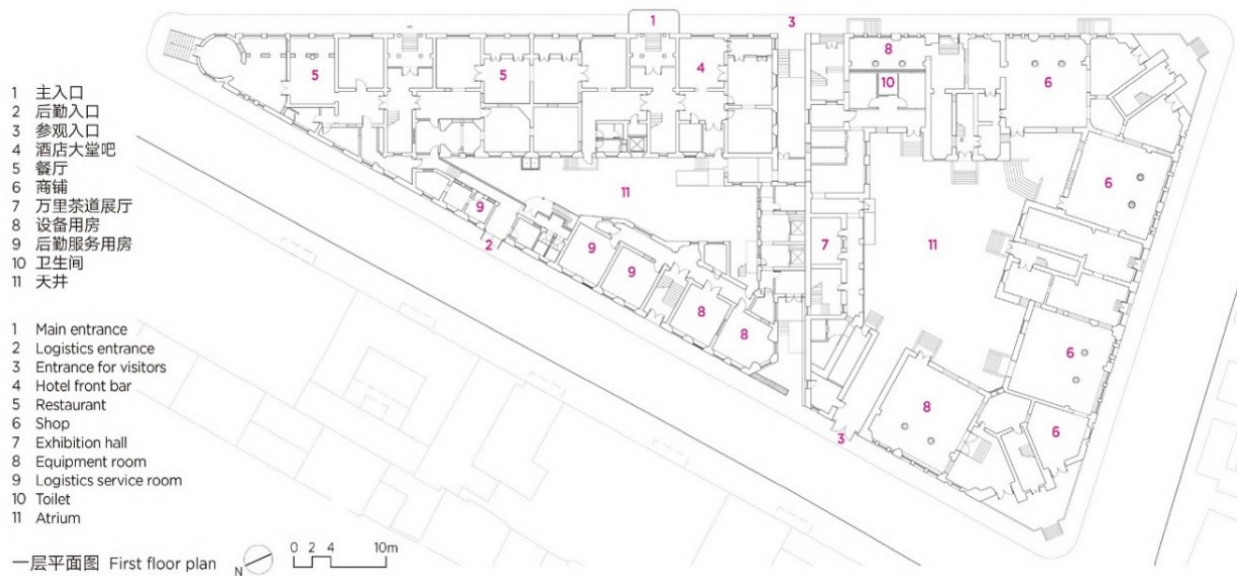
First floor plan of Panoffs' Mansion after the rehabilitation project
